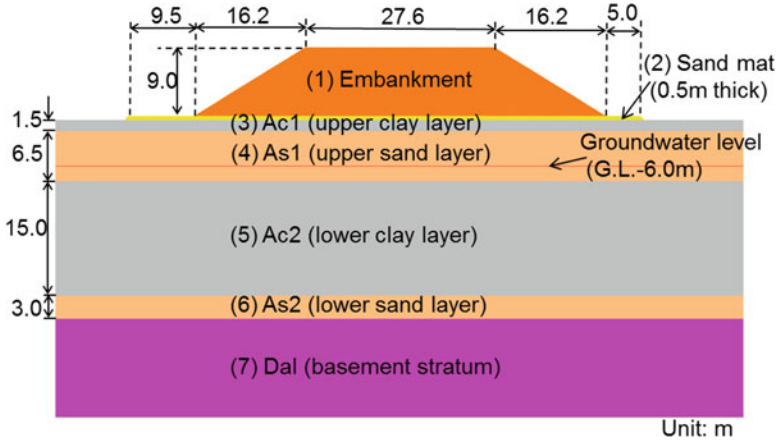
Sectional view of the highway embankment (Ohta et al. 2005)
